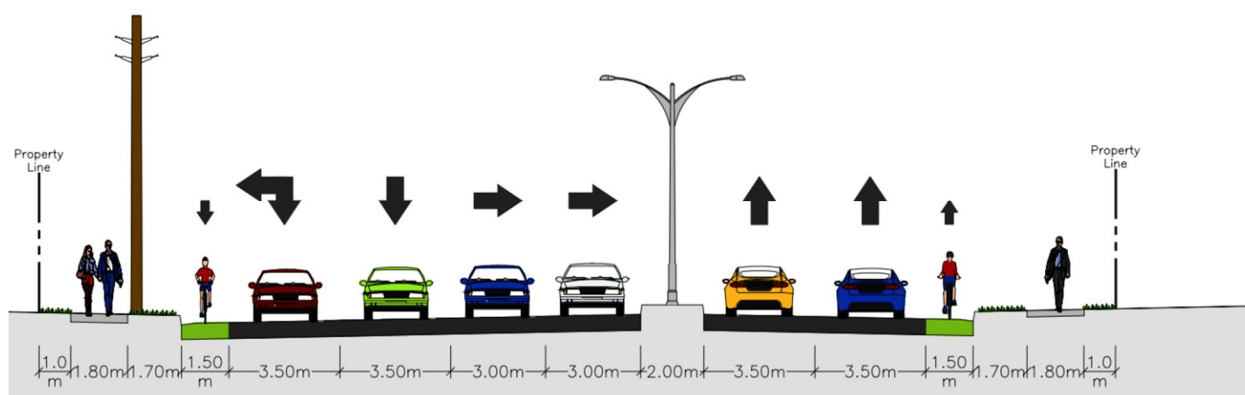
Preferred Design, Hamilton Road Cross-Section, East of Highbury Avenue North
